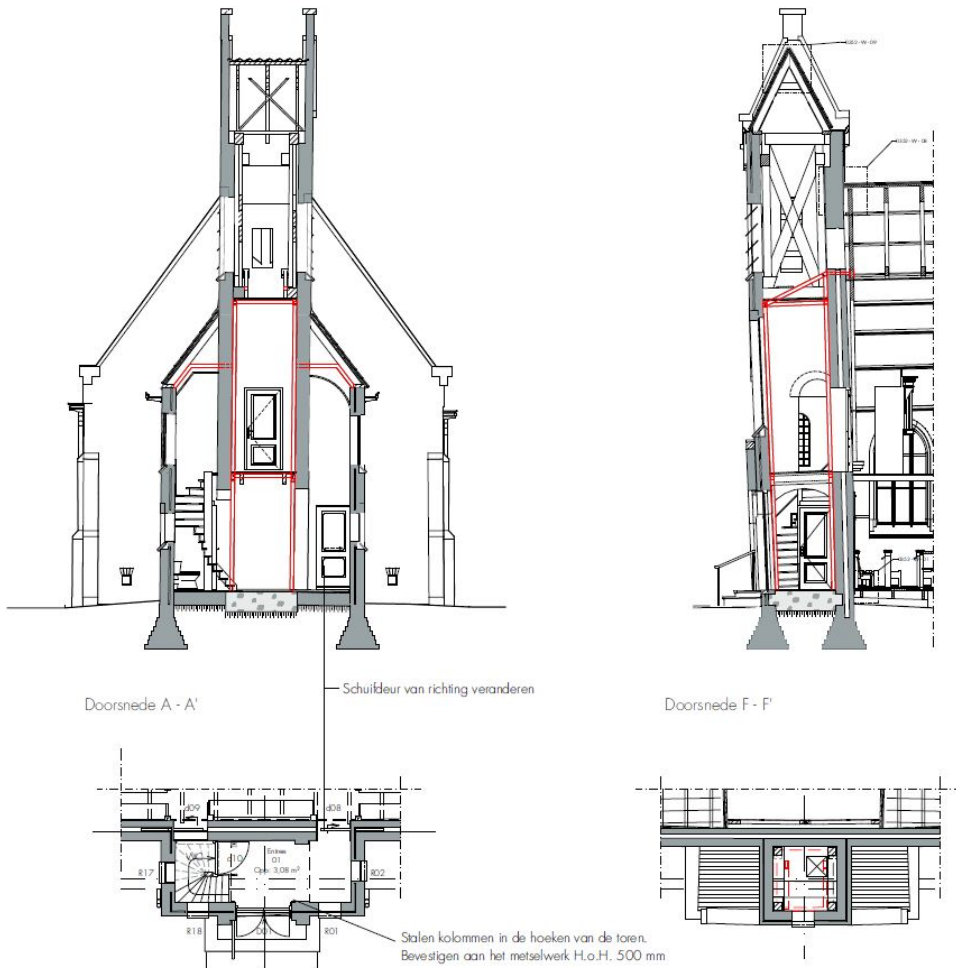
Main Facade and Bell tower after structural modifications- Installation of steel framework (Front View, side view, Top view- ground level, Top view-first level/clock loft respectively clockwise)
